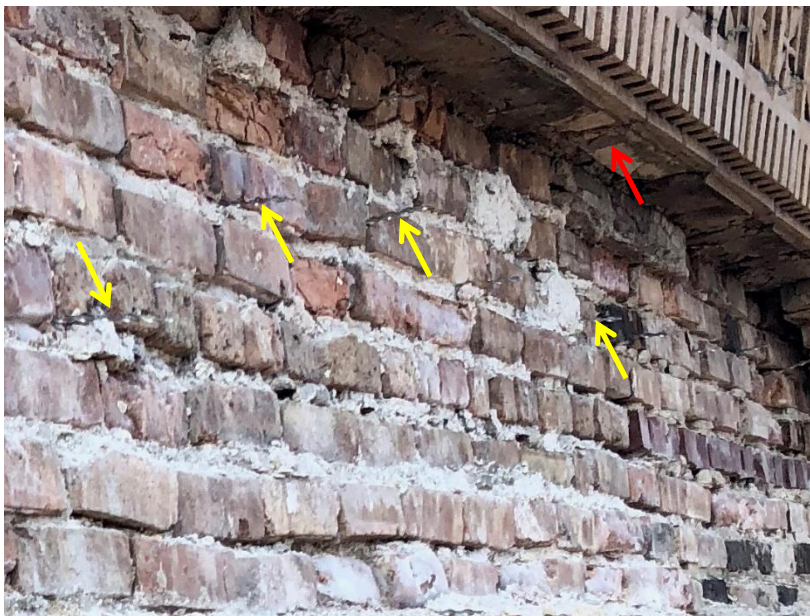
Previously installed supplemental helical anchors near top of failed area (yellow arrows); it is unclear whether the terra cotta units above (red arrow) are deep enough to bear on the backup brick masonry, or whether any shoring was installed prior to covering the area with the tarp (photo courtesy of FHP)
